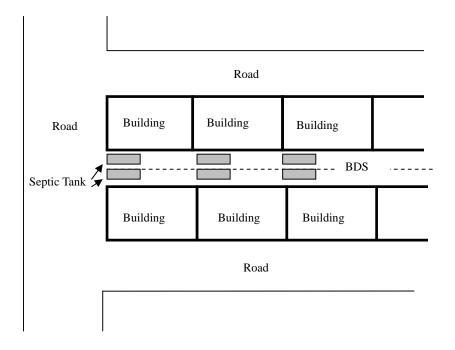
Typical Arrangement of Septic Tanks in BDS
